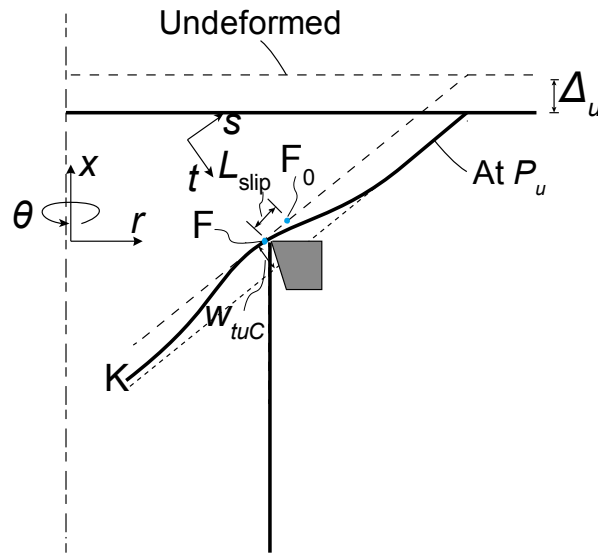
Sketch of ultimate behavior of specimens with conical wall failure
